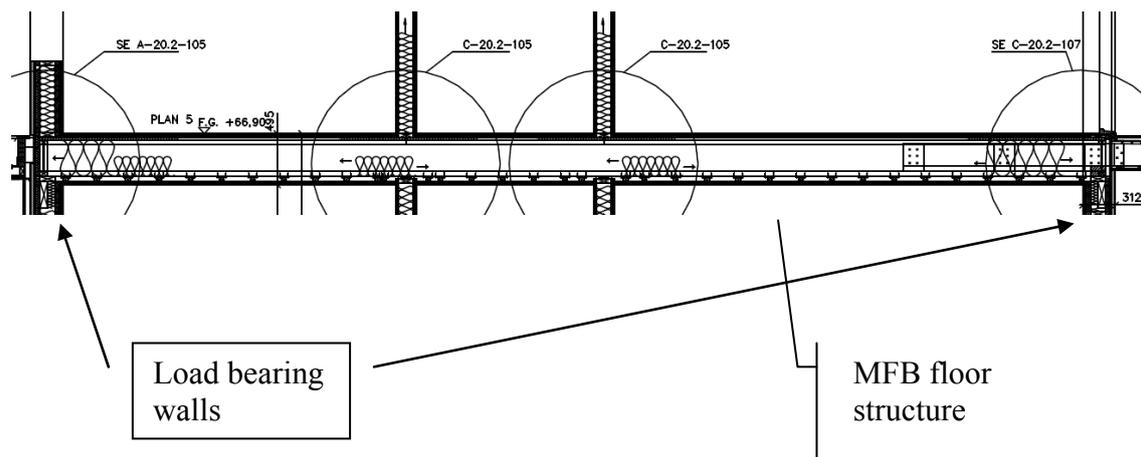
The intermediate floor structure and its connection to the walls for the project manufactured on – site.
